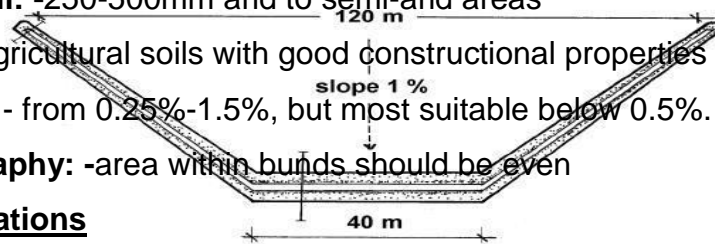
Trapezoidal bunds: field layout for 1% ground slope
